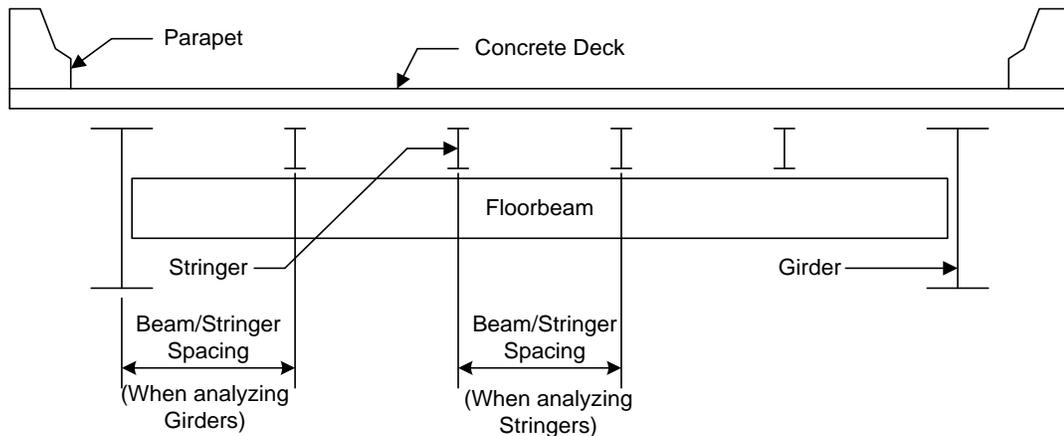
Beam/Stringer spacing for Girder-Floorbeam-Stringer system
